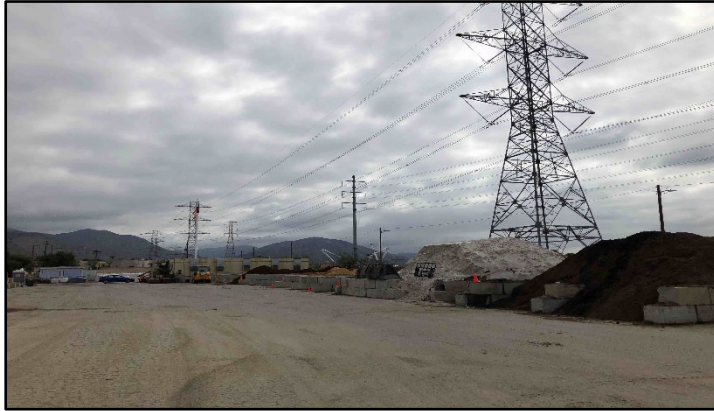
View looking northeast across the project site from the southwestern part of the site.
